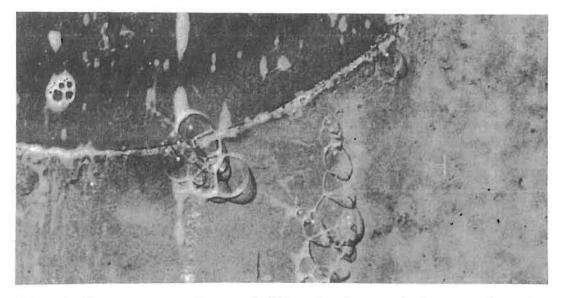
Close-up view of soap bubbles forming in leak areas through a concrete wall.
